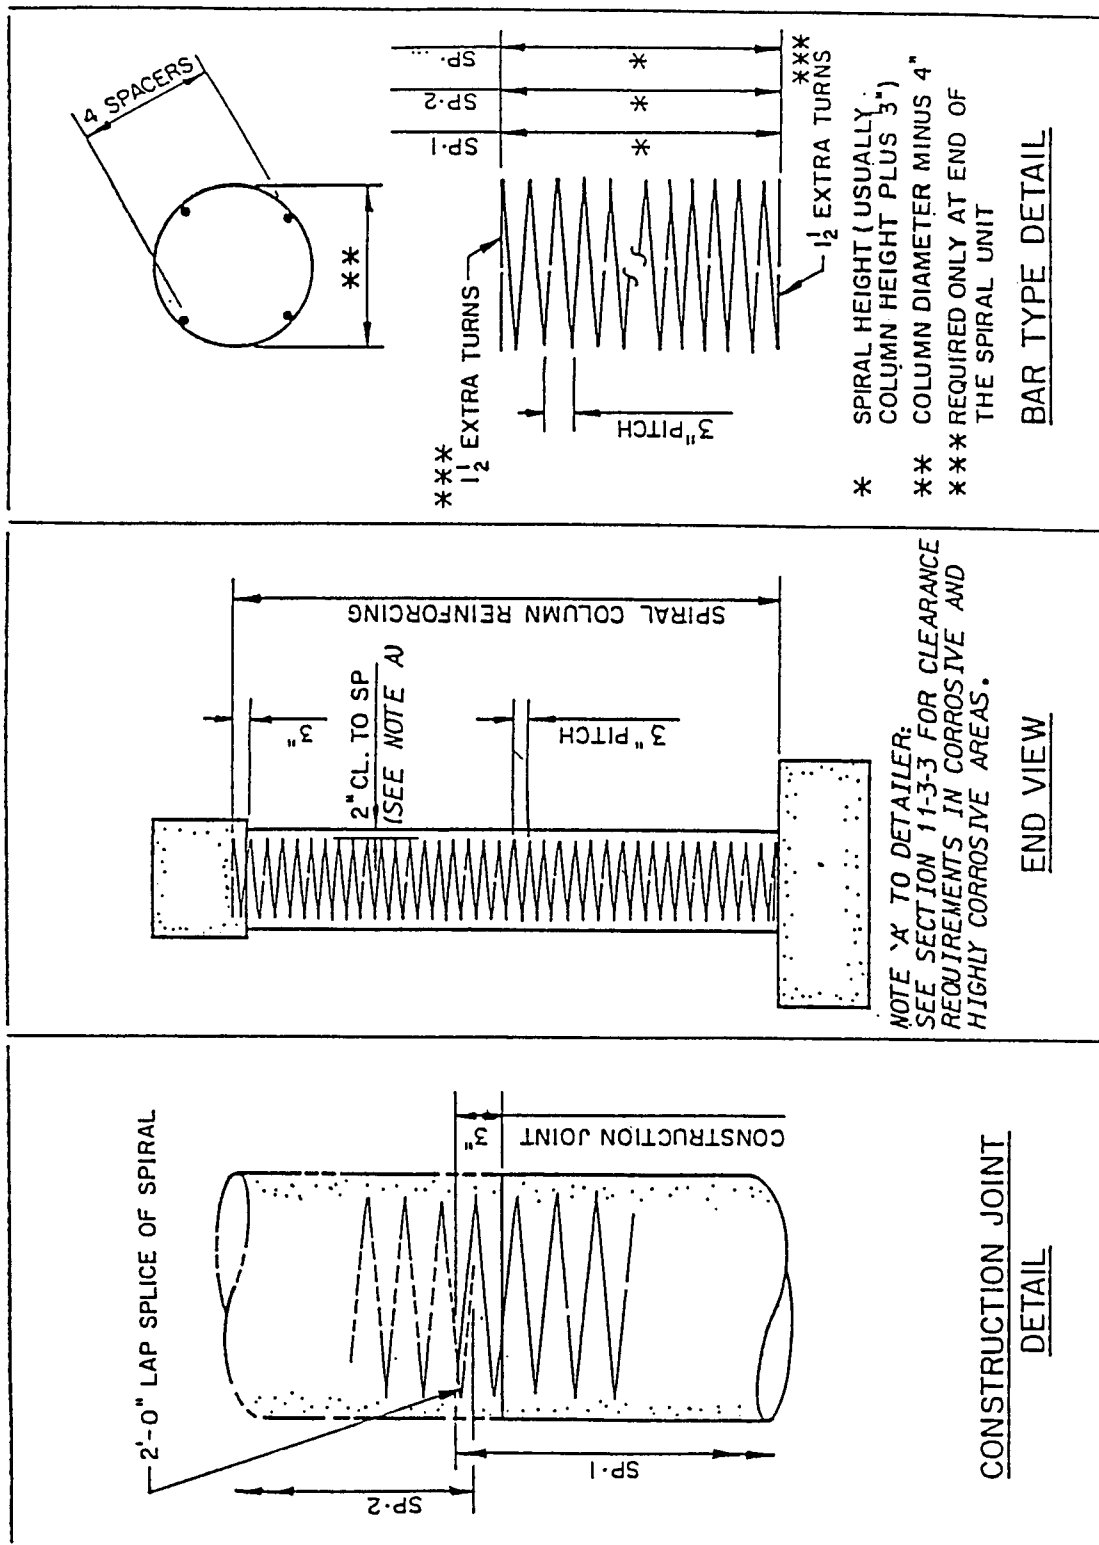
New York Vertical Column Reinforcement Requirements
